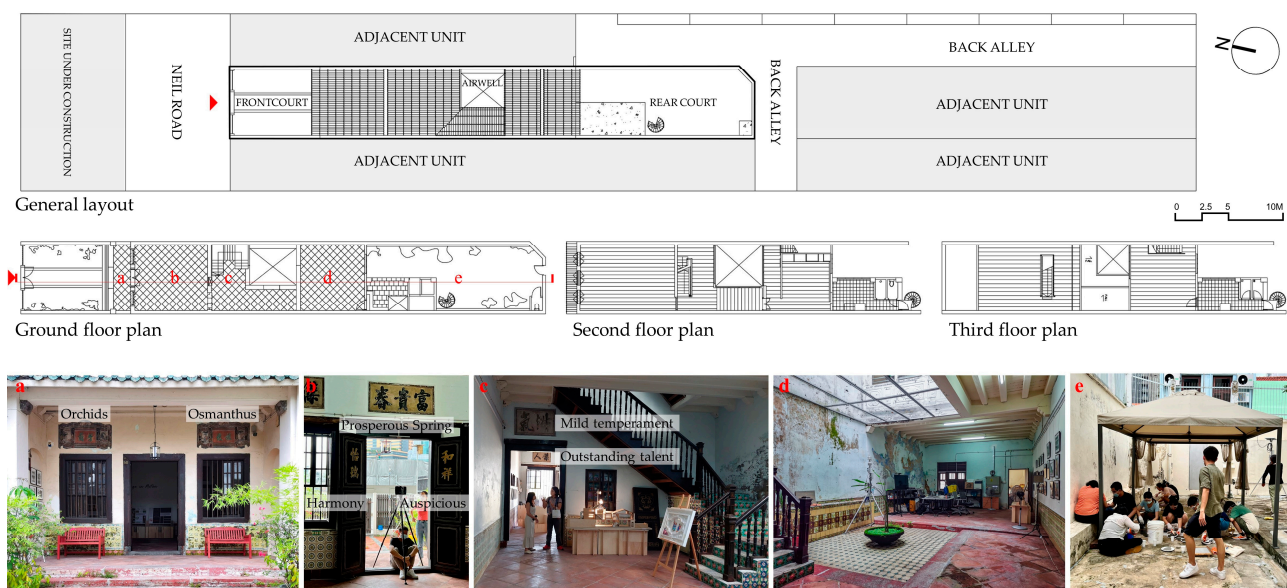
The general plan, floor plans and internal spaces of 141 Neil Road (photos by authors).
